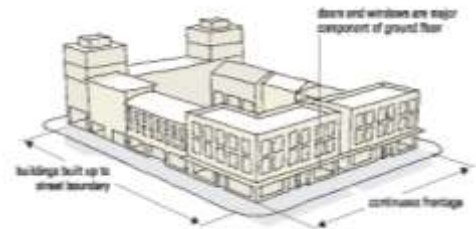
Continuous ground floor frontage with shop windows and entries. Windows at upper levels looking over street.
